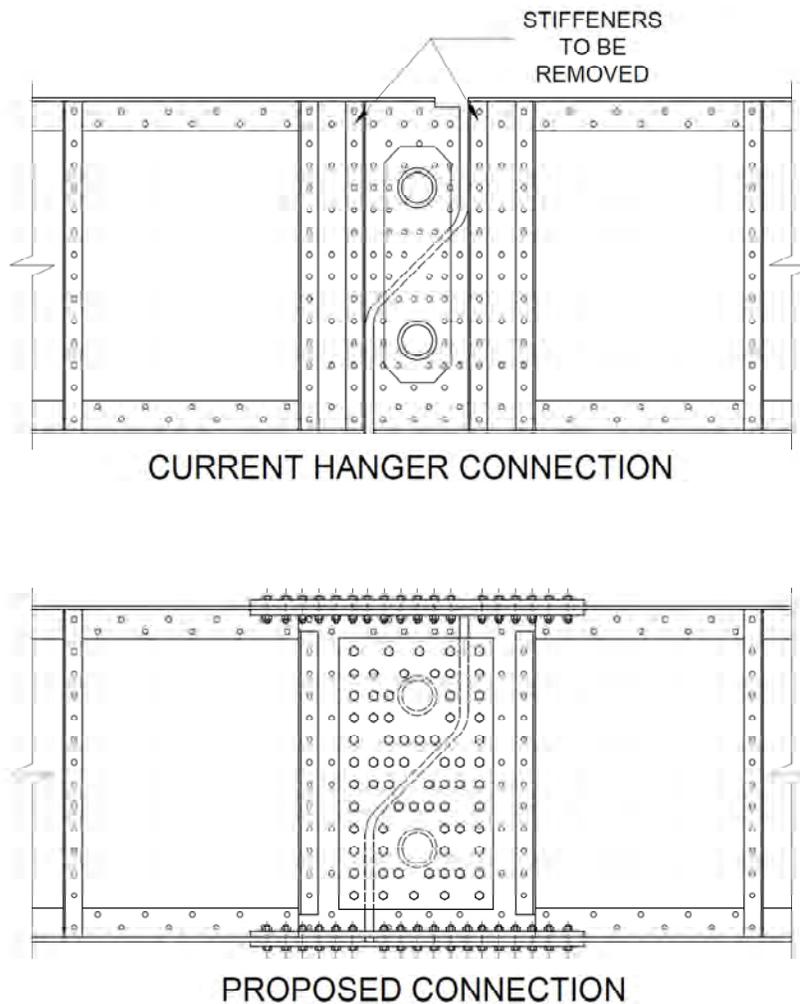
MODIFIED CONNECTION AT HANGER LOCATIONS
